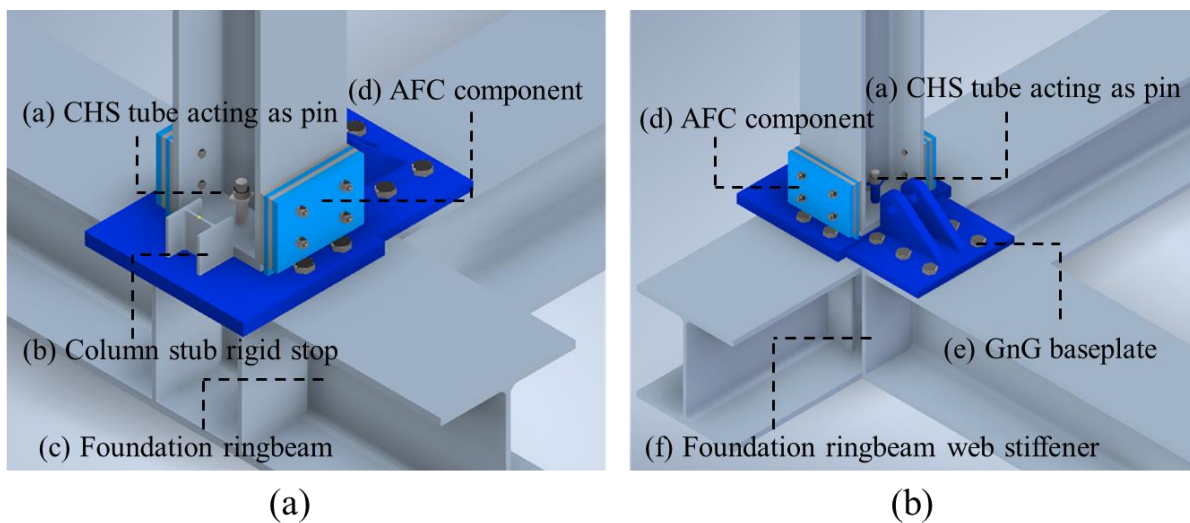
Column Base Connection at Concurrent Column (a) and (b)
